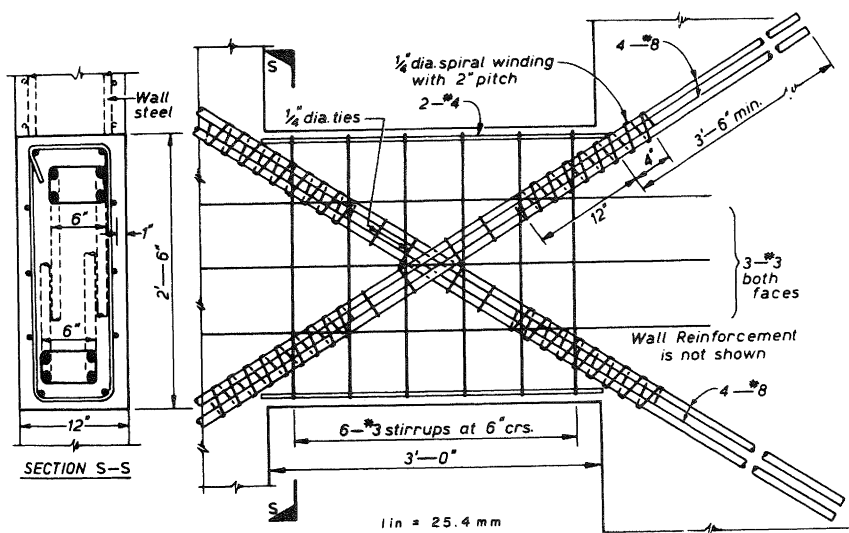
Typical Details of a Diagonally Reinforced Concrete Coupling Beam (6)
